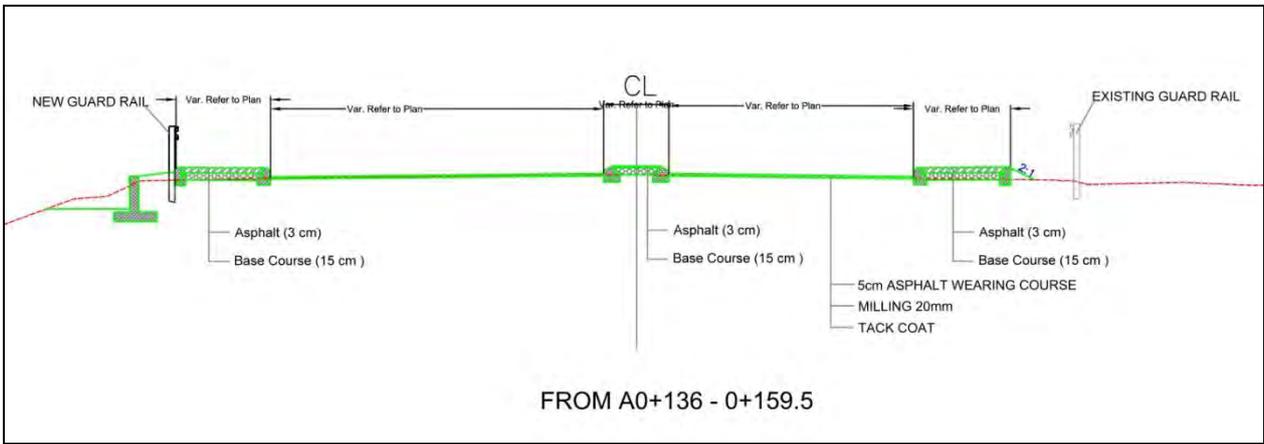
Project 07- HEB- Beit Nooon- Segment A- Typical cross section from St. A0+136 to St. A0+159.5.
